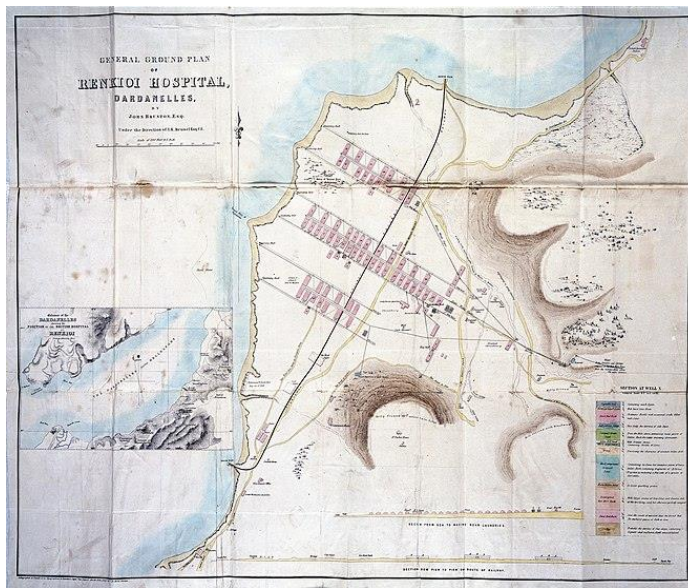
Site Plan of Renkioi Hospital, Mark Isambard Brunel
